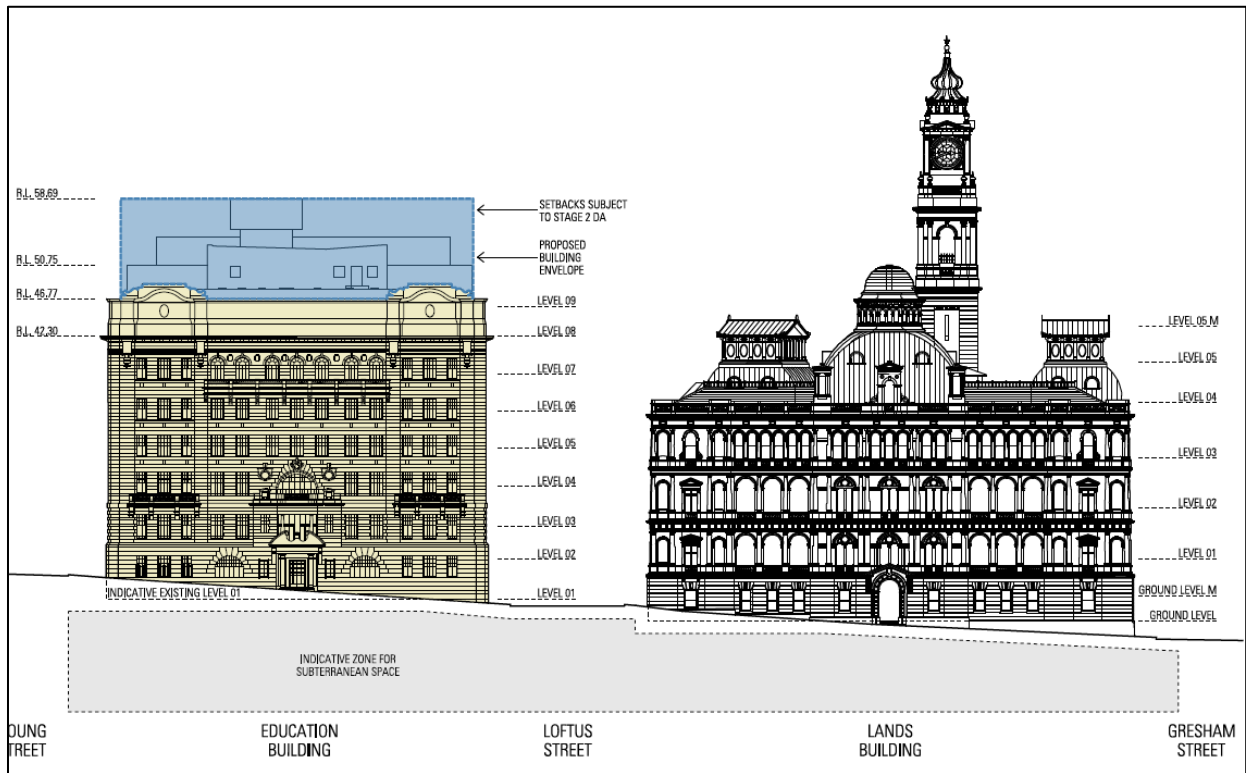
INDICATIVE PROPOSED BUILDING ENVELOPE (LOOKING EAST)
